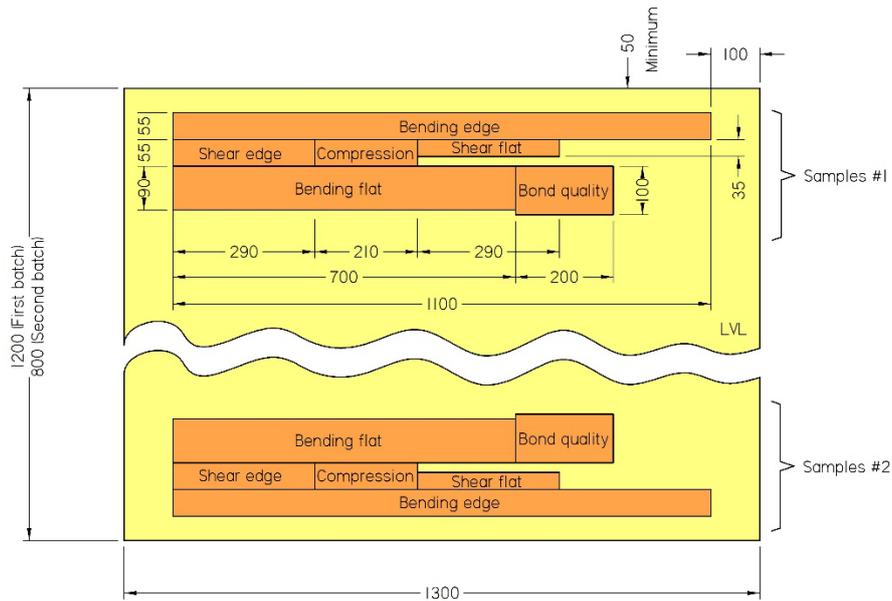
Cutting plan for each LVL to obtain testing samples (units: mm).
